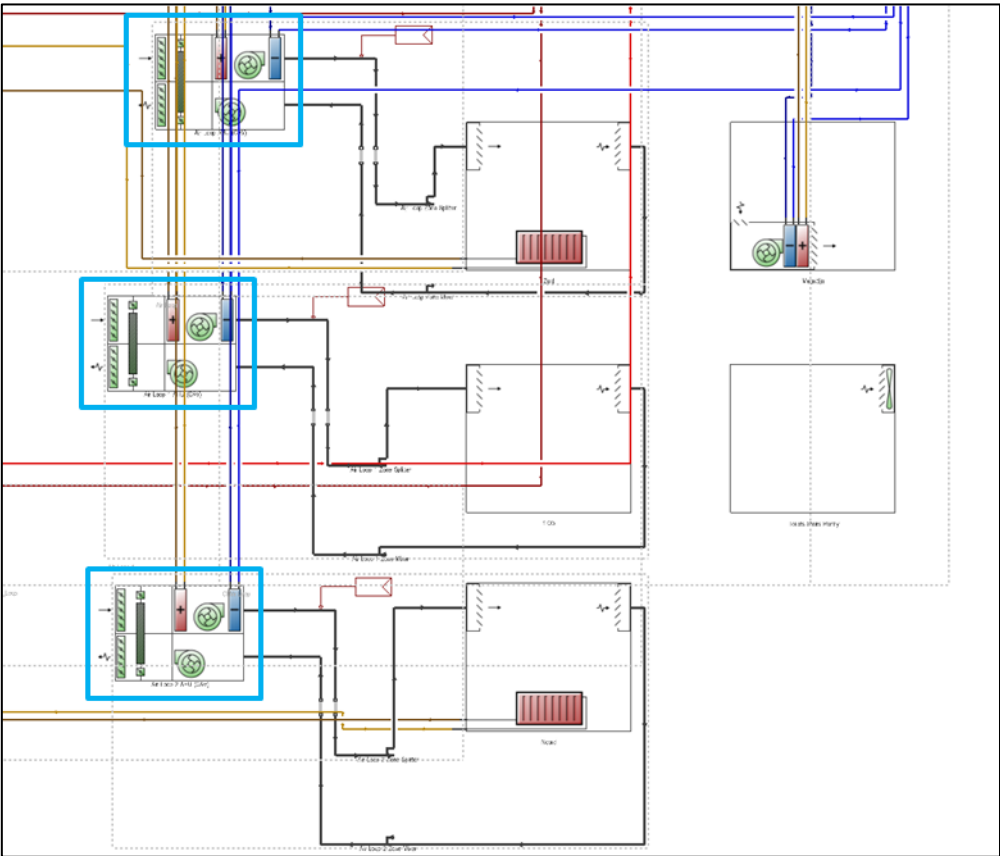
HVAC layout of office building in Breda designed in DesignBuilder
